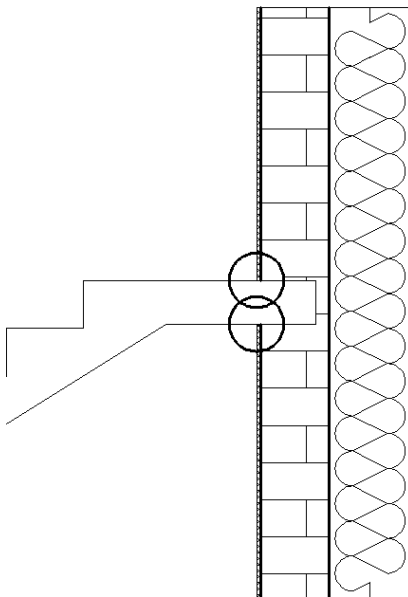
Location of the Thermal bridge in the connection of the exterior wall with the staircase slab. [66]
